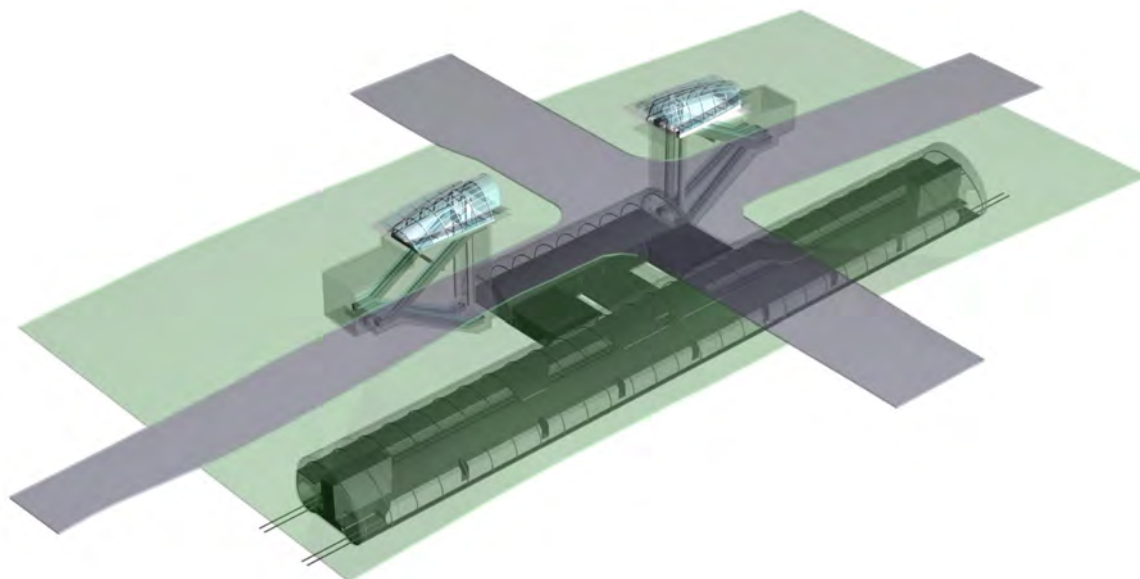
An indicative example of an underground station showing two surface entrances and the underground platforms
